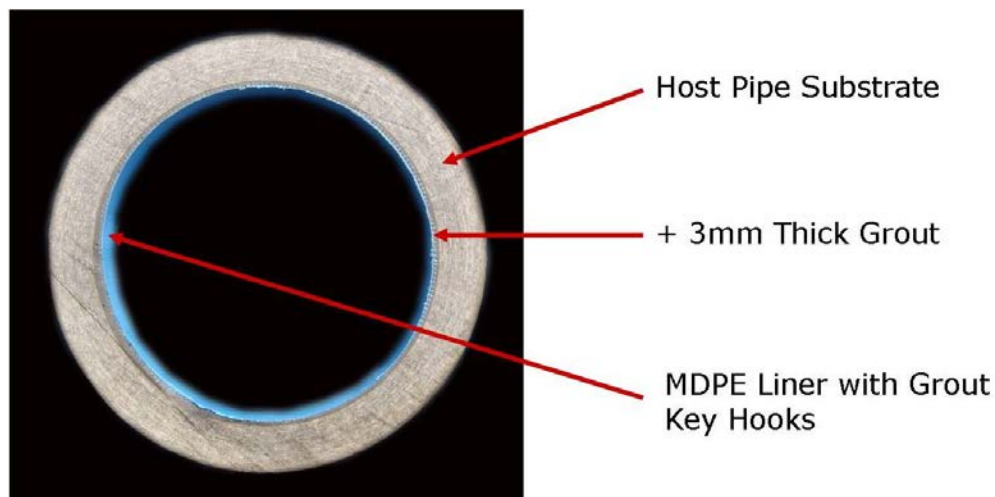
Cross Section of MainSaver™ (courtesy of MainSaver™)
